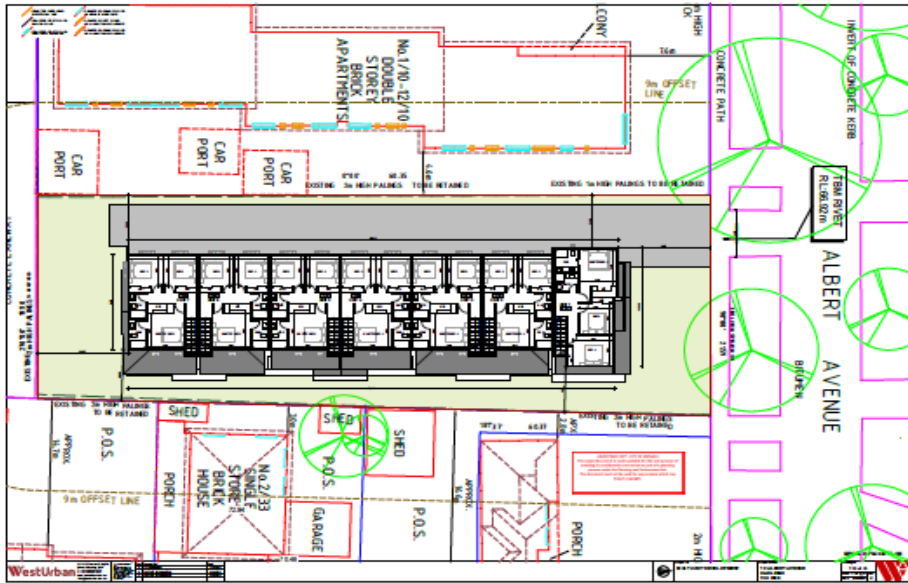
Layout and Elevation Plans (Source - Advertised Plans)
